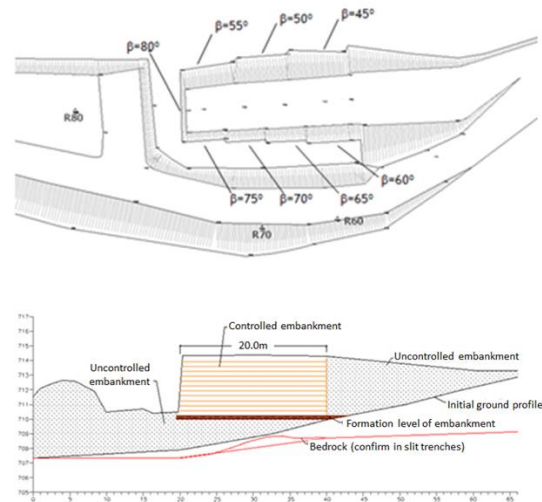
Plan and elevation of the controlled embankment (Neves, 2015).
